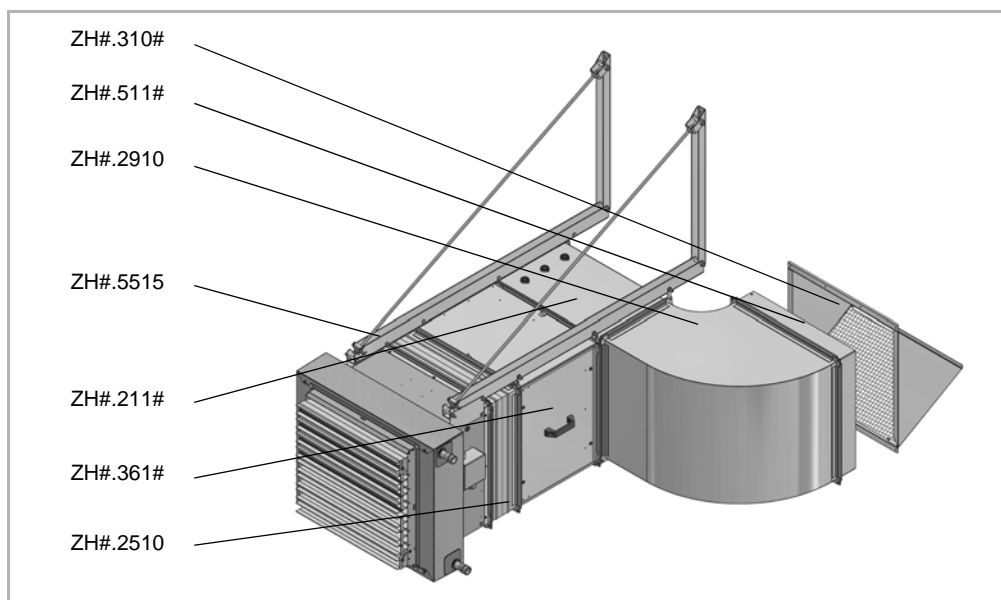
Wall mounting of a mixed-air unit with „Modular“ suspension (ZH#.550#)
